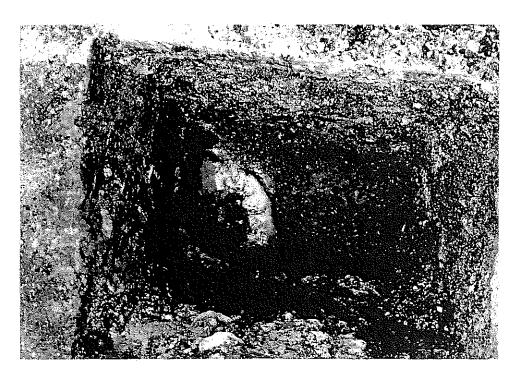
BEND IN PANEL AT OUTLET CONNECTION.
